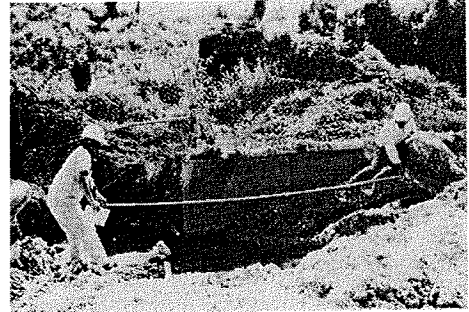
3.6m Offset of a Drainage Pipe at Point H (Refer to Fig. 3)
